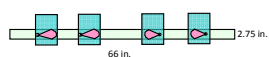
CFRP anchors applied to columns and wall for better attachment of the CFRP sheets (Kobayashi, 2001) and CFRP strip for installation
